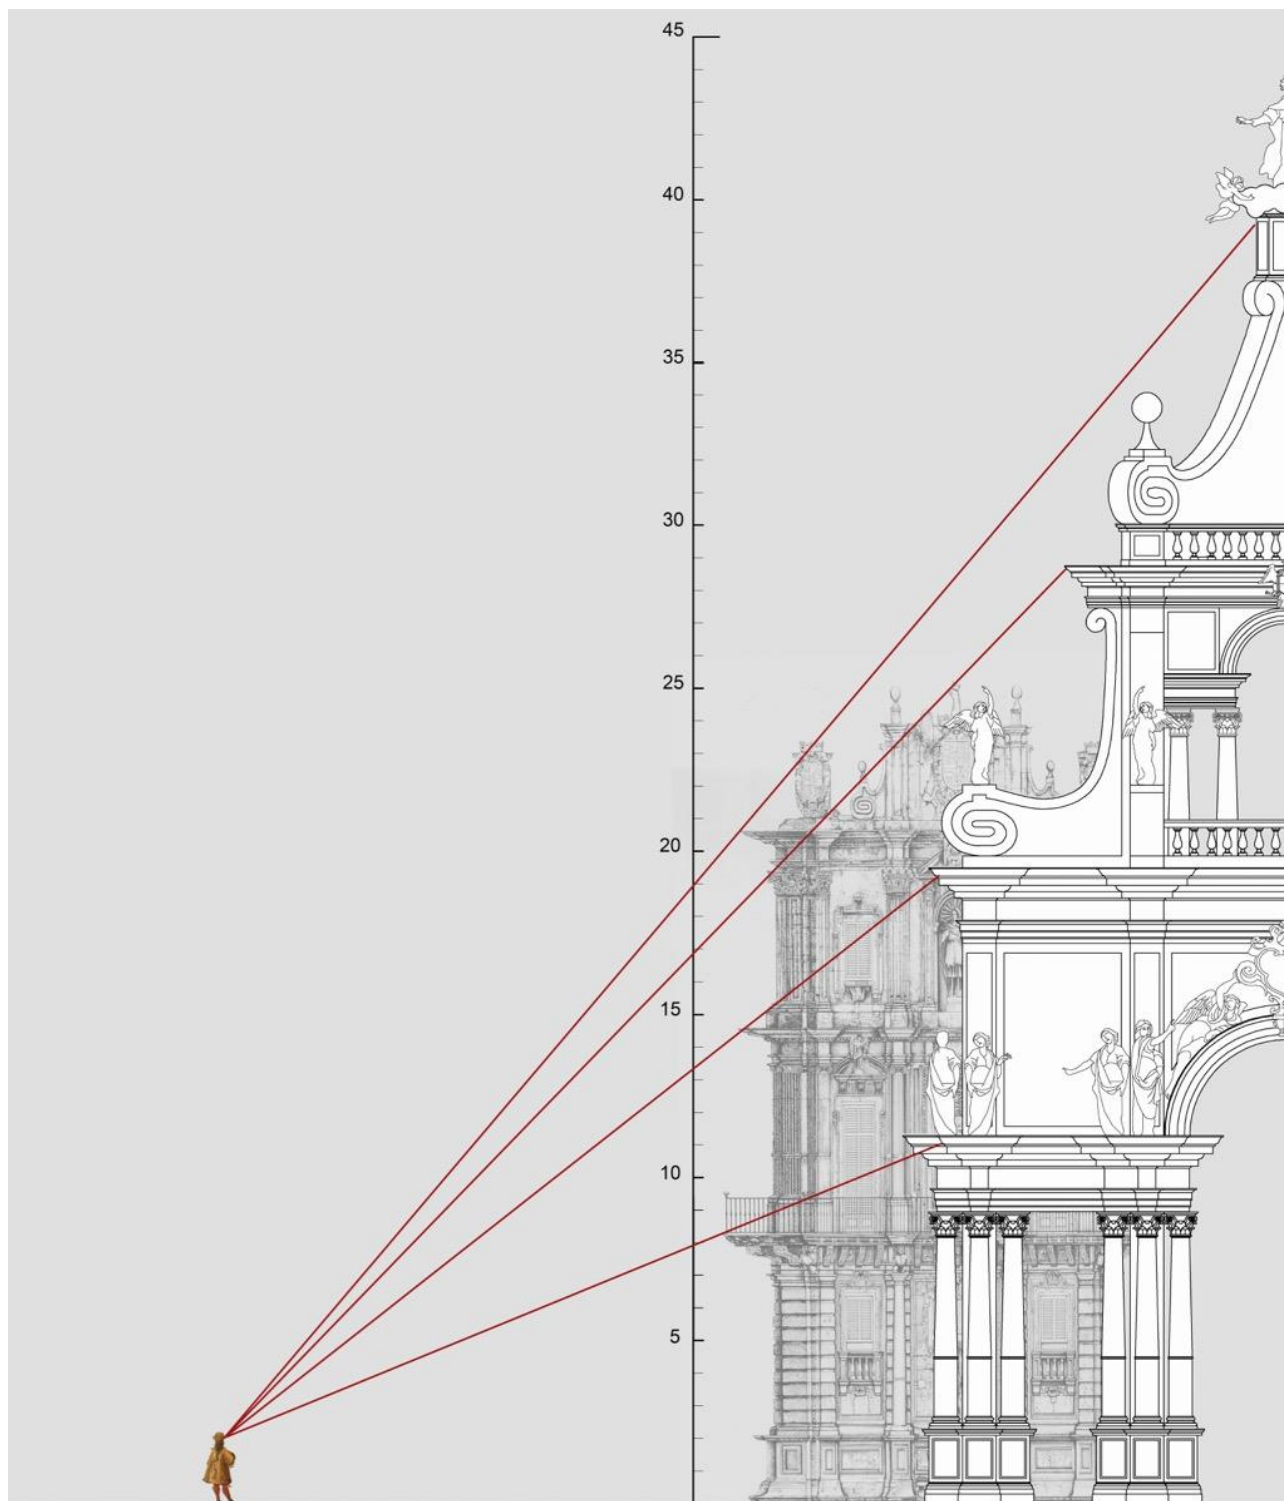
Reconstruction detail of the Arco ai Quattro Canti in elevation with red lines connecting main horizontal lines of Arch and Quattro Canti facades (Drawing by F. Colonnese).
